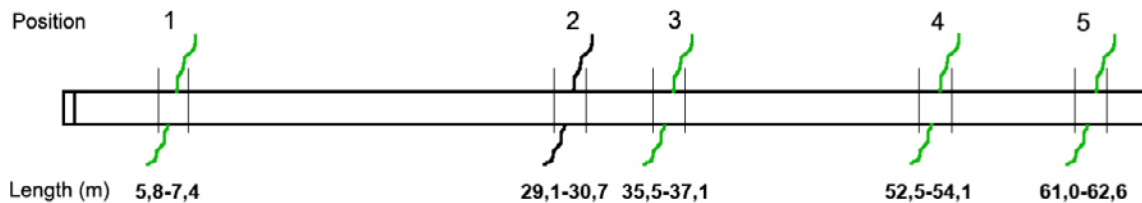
Position 1,3 and 5 grouted. Position 4 is about to be grouted.
